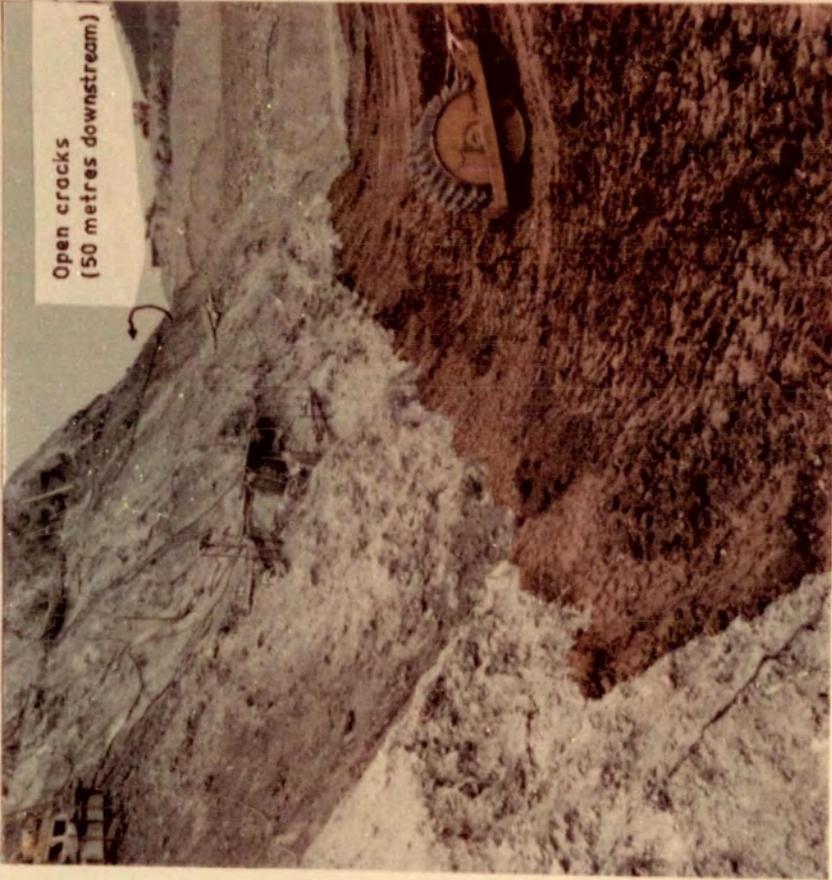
Clay core placement on the main fault zone of the left abutment and wide open crack downstream ( Assomata dam )
